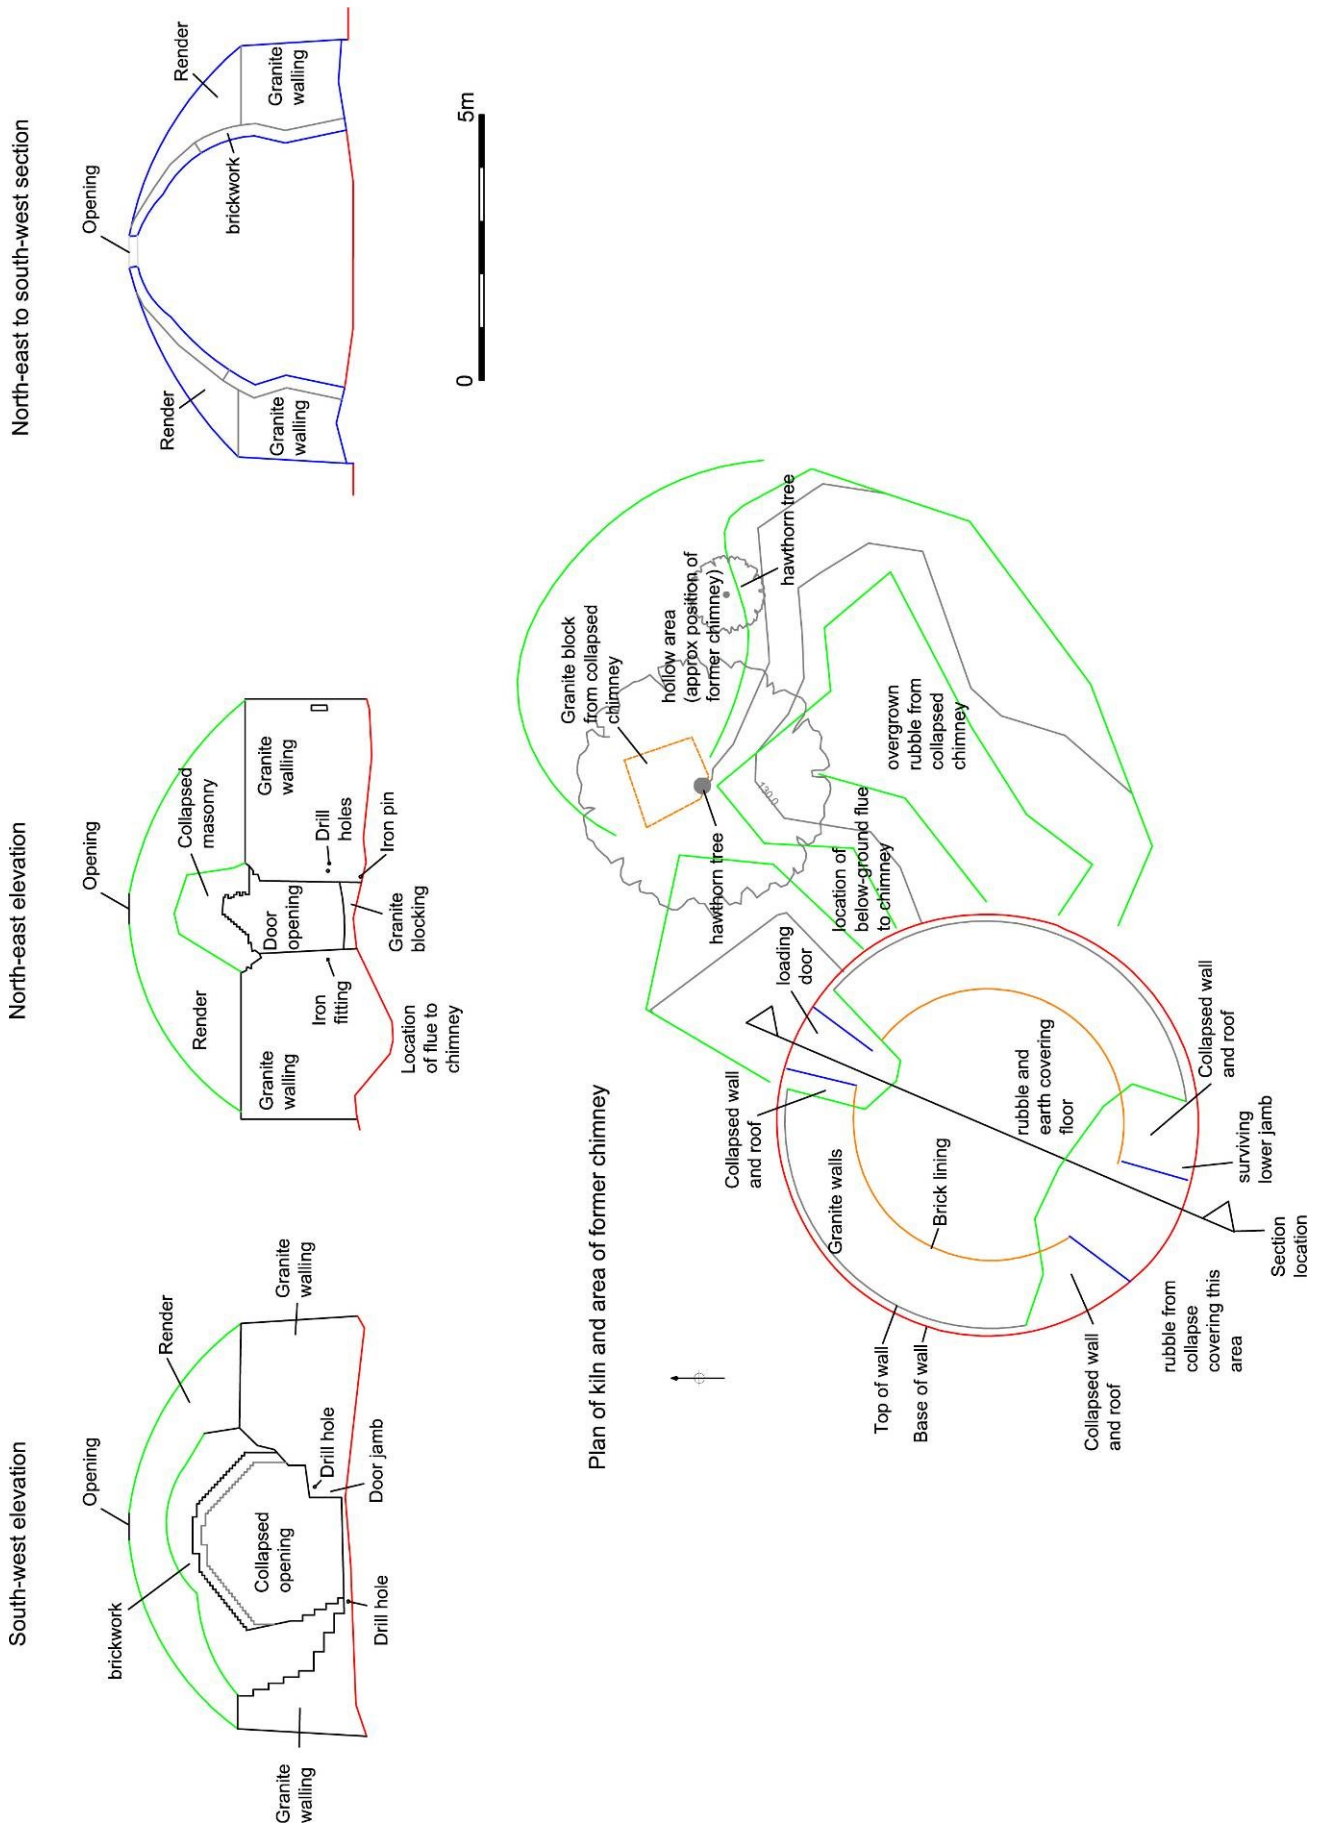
Plan, elevations and section (based on Nationwide Surveys drawing)
